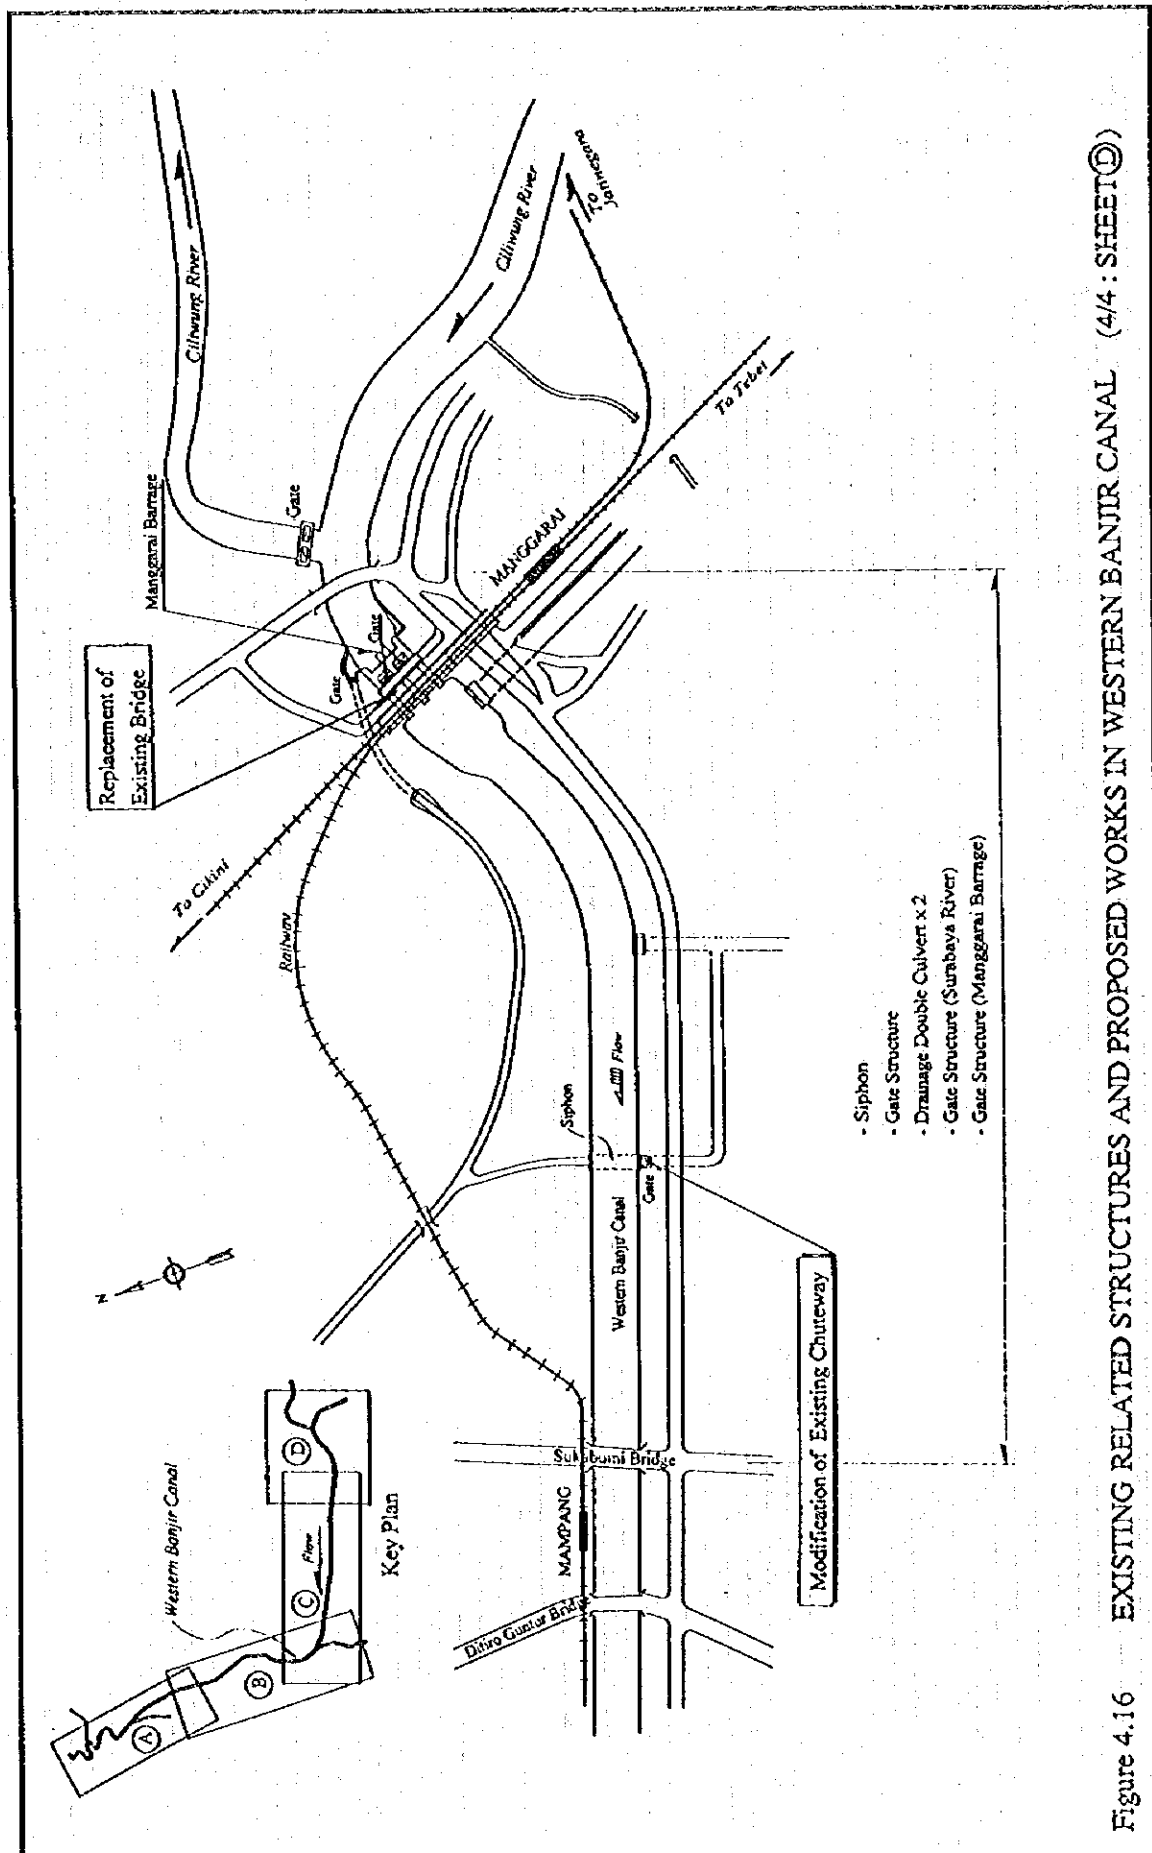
EXISTING RELATED STRUCTURES AND PROPOSED WORKS IN WESTERN BANJIR CANAL (4/4 : SHEET ④)
